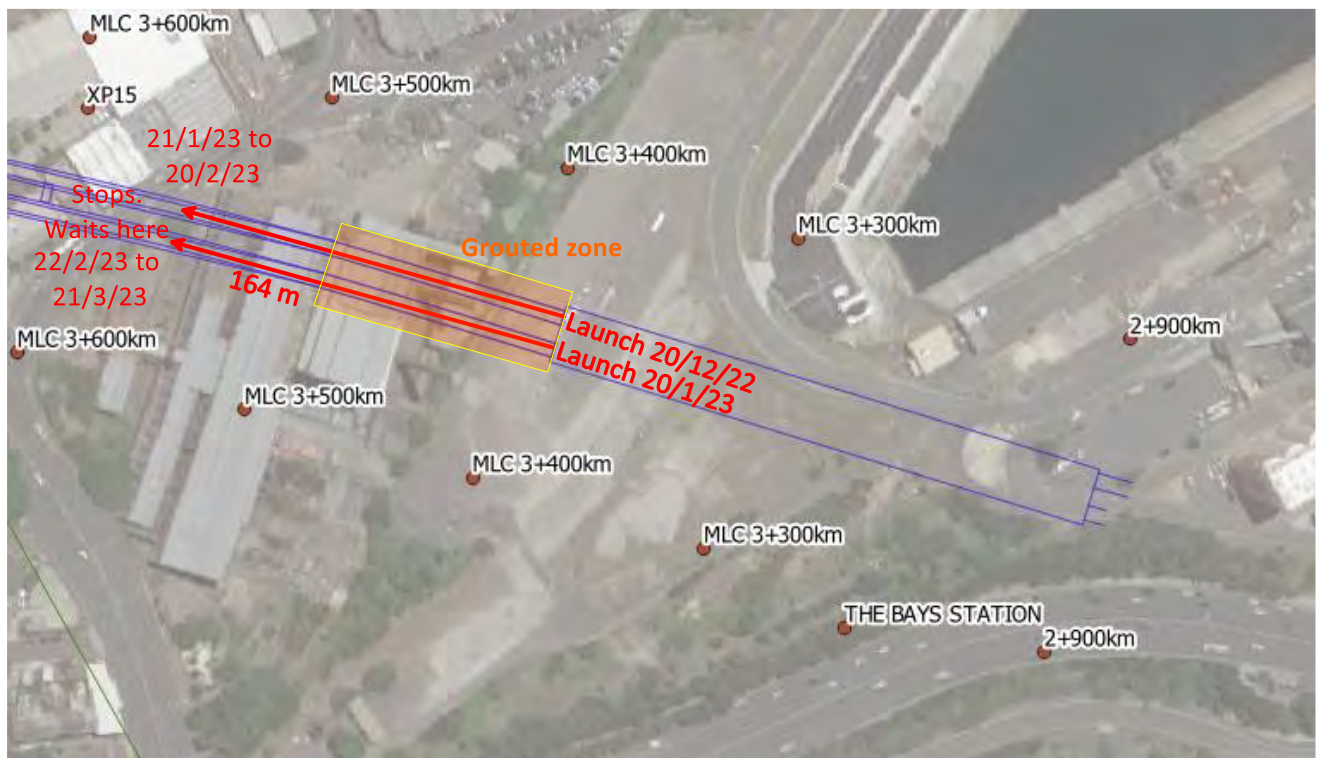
TIMEFRAMES AND LOCATIONS OF TBM MINING AND GROUTED ZONE AT WHITE BAY POWER STATION
